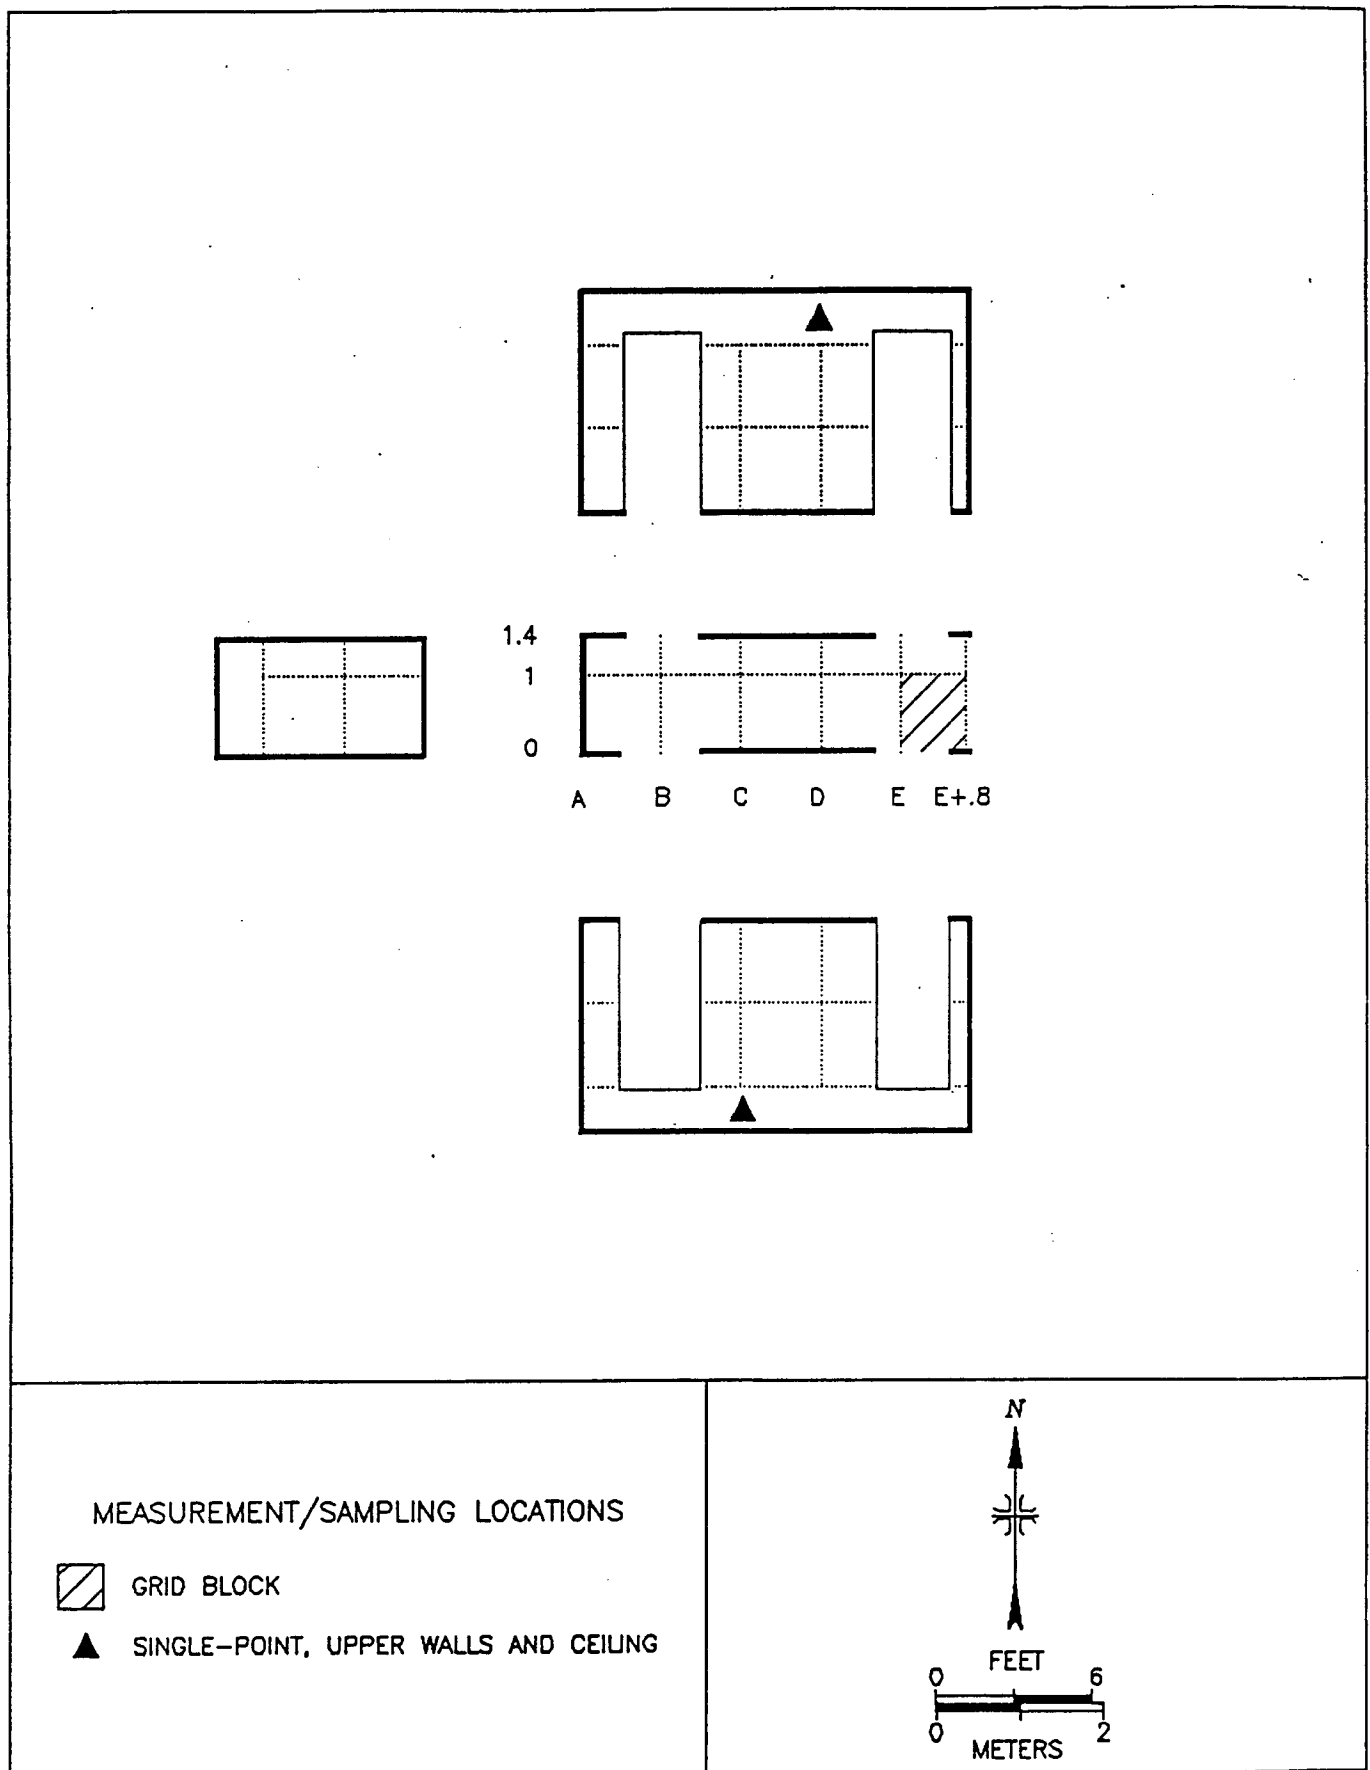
Building 401A, Room 7, (Hallway) – Measurement and Sampling Locations
